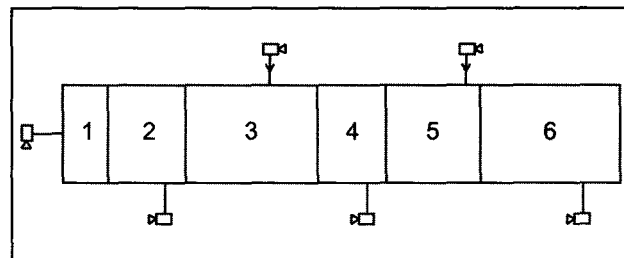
Fans installed on opposite sides in uncluttered layout.
